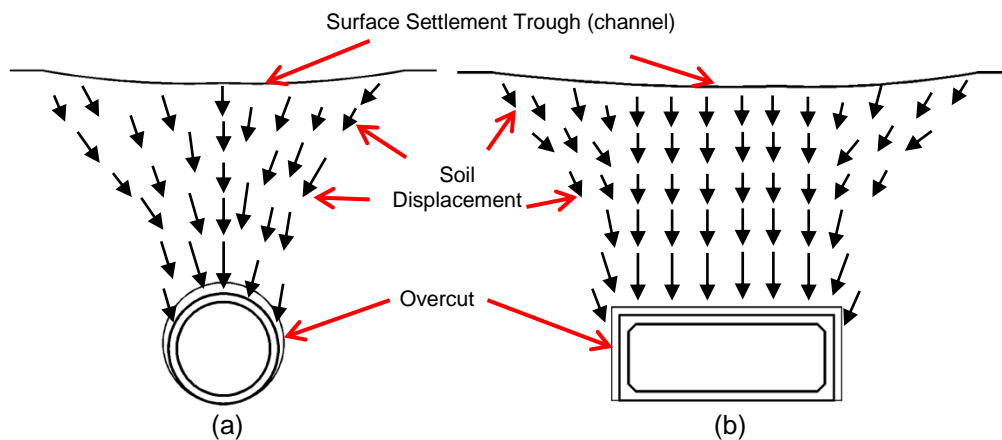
Trailing Settlement: a) Pipe Culvert, and b) Box Culvert
